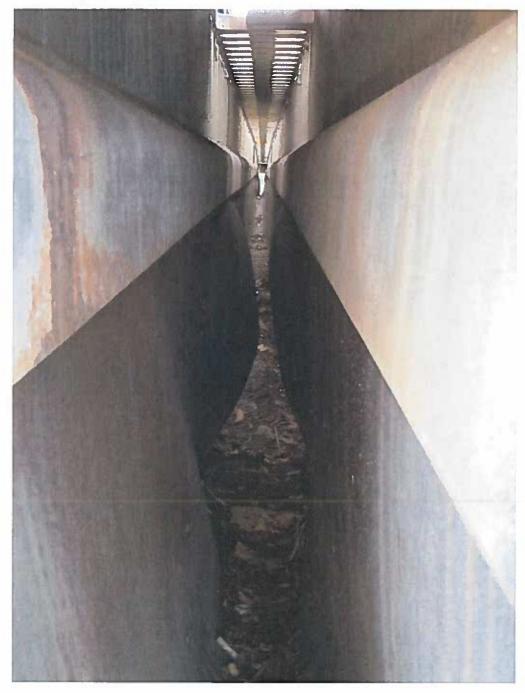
DIRT AND DEBRIS IN PIER 4 EXPANSION JOINT TROUGH.
